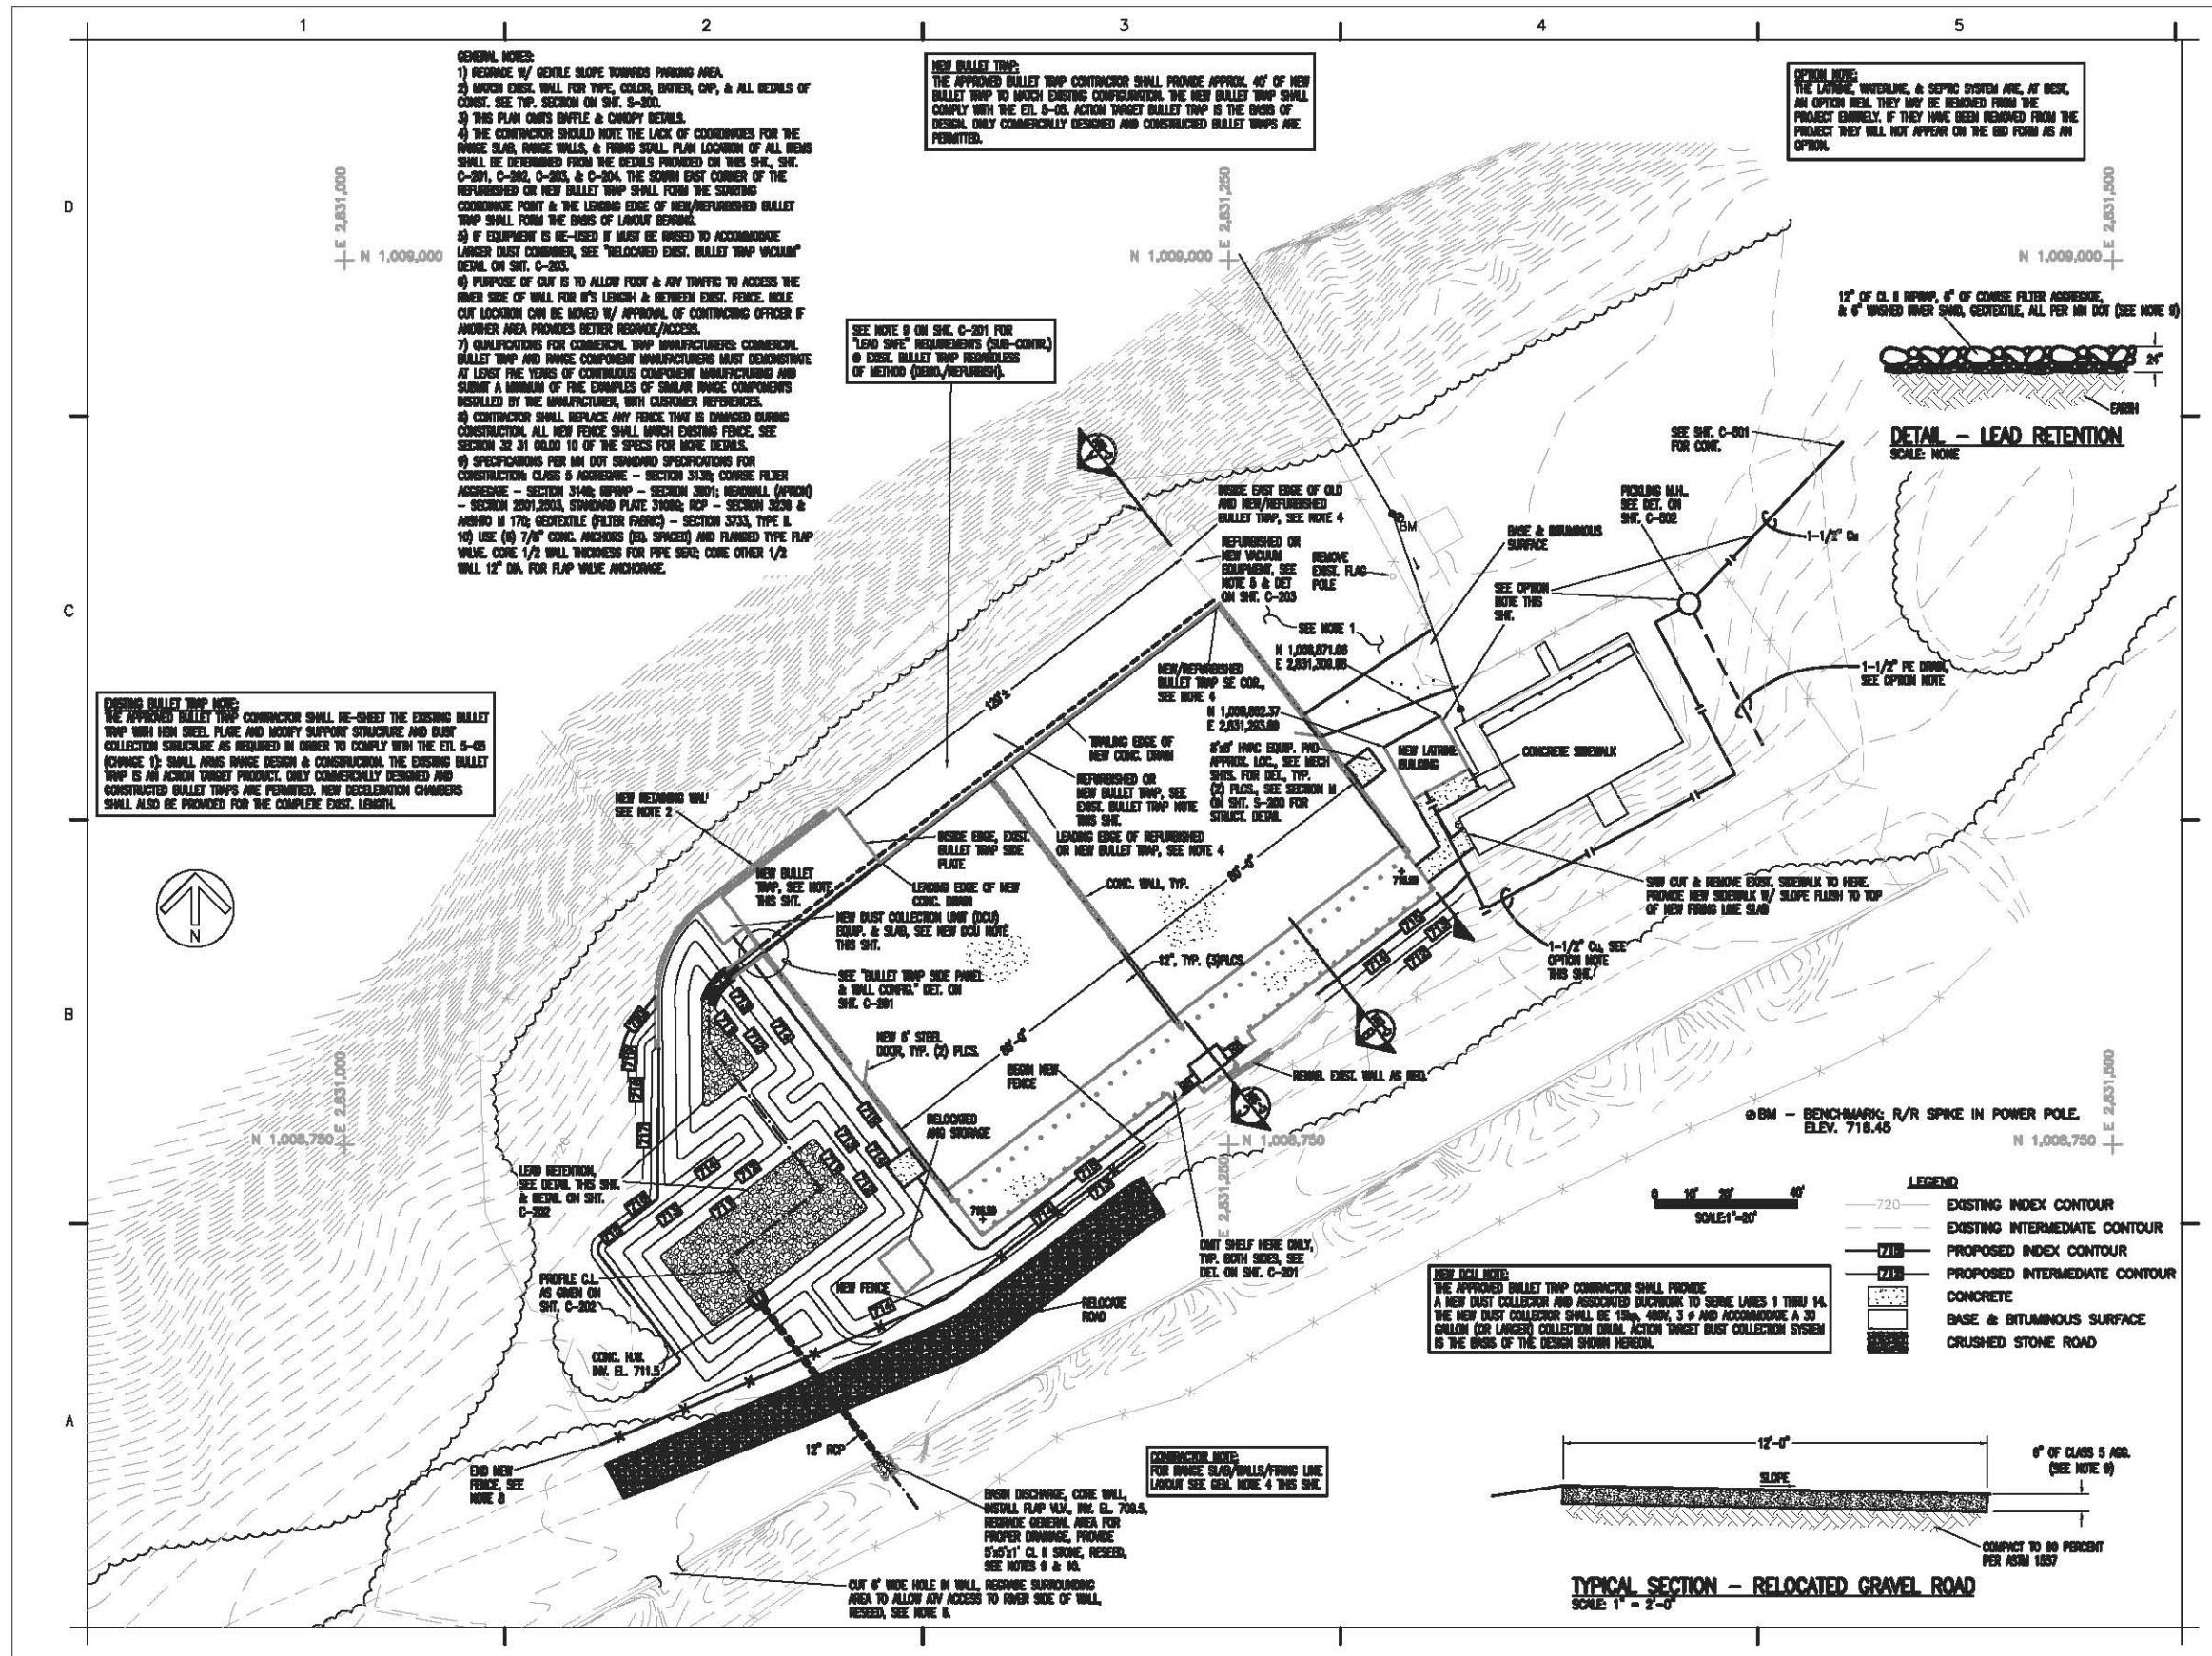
Proposed Joint Use Small Arms Range and Site Modifications
